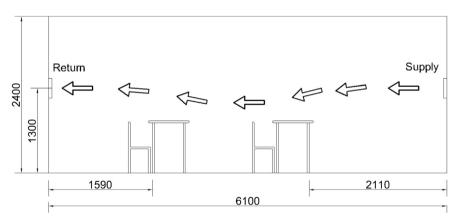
Stratum ventilation with front wall supply and rear wall return at mid-height of walls.
